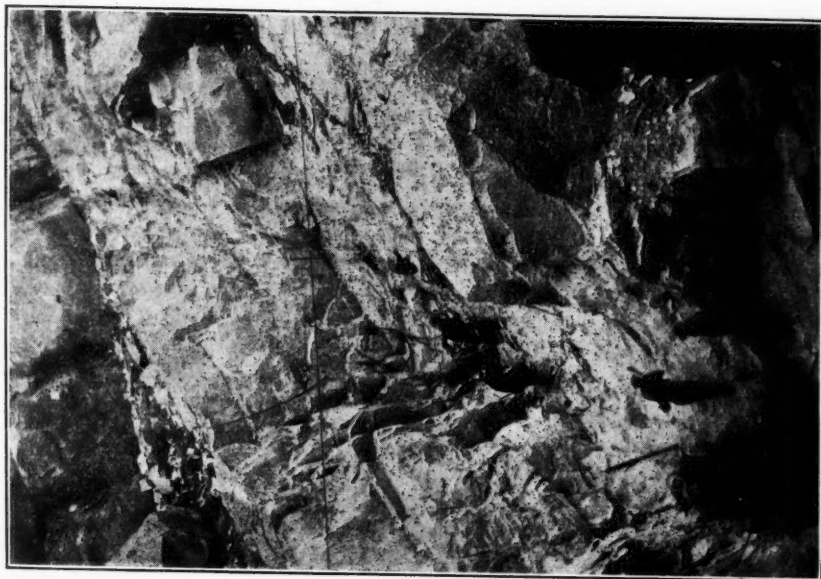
FOUNDATION ROCK, SOUTH ABUTMENT, STEVENSON CREEK TEST DAM.
